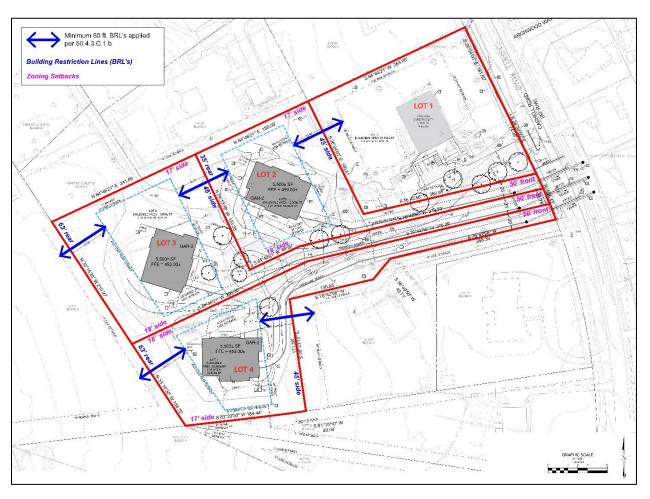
Composite Pre-Preliminary Plan (BRL's shown in blue)
